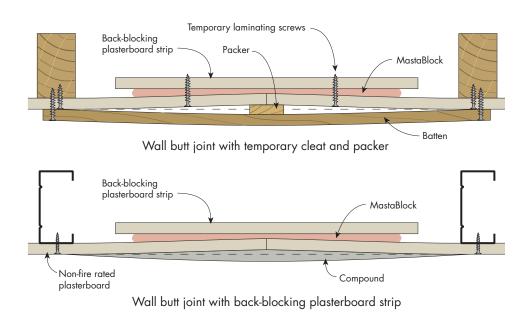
Creating a Recess at a Wall Butt Joint Using Laminating Screws - Plan View
